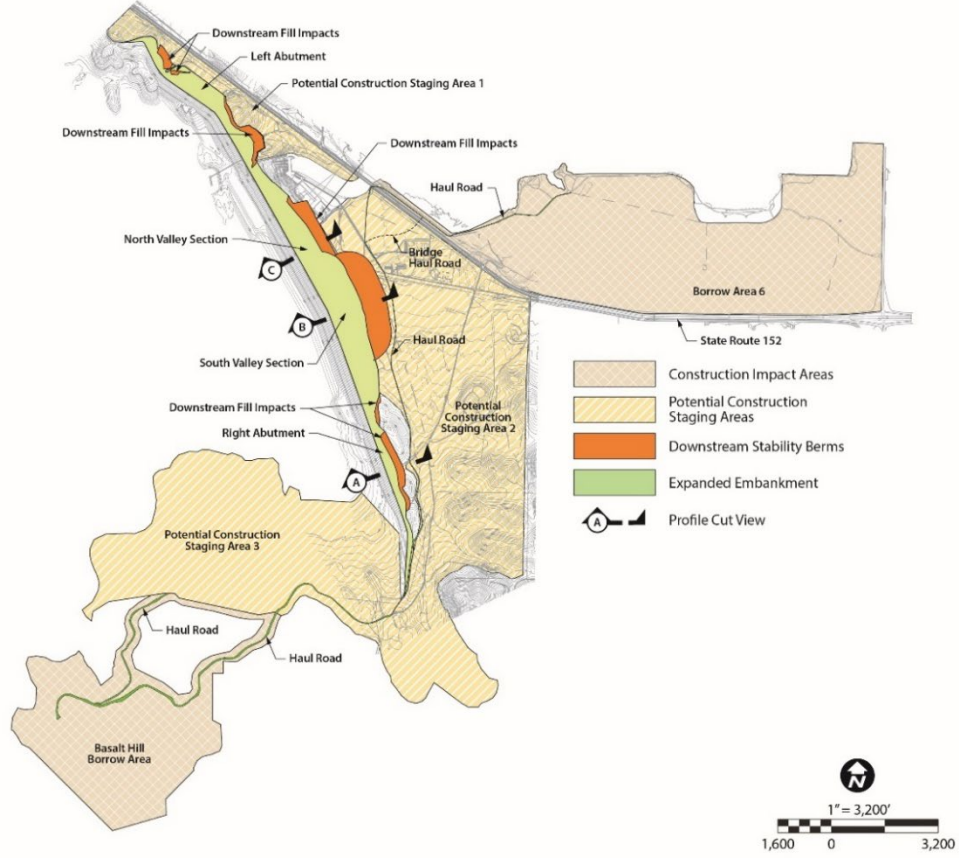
Dam Raise Facilities, Construction, and Staging Areas
